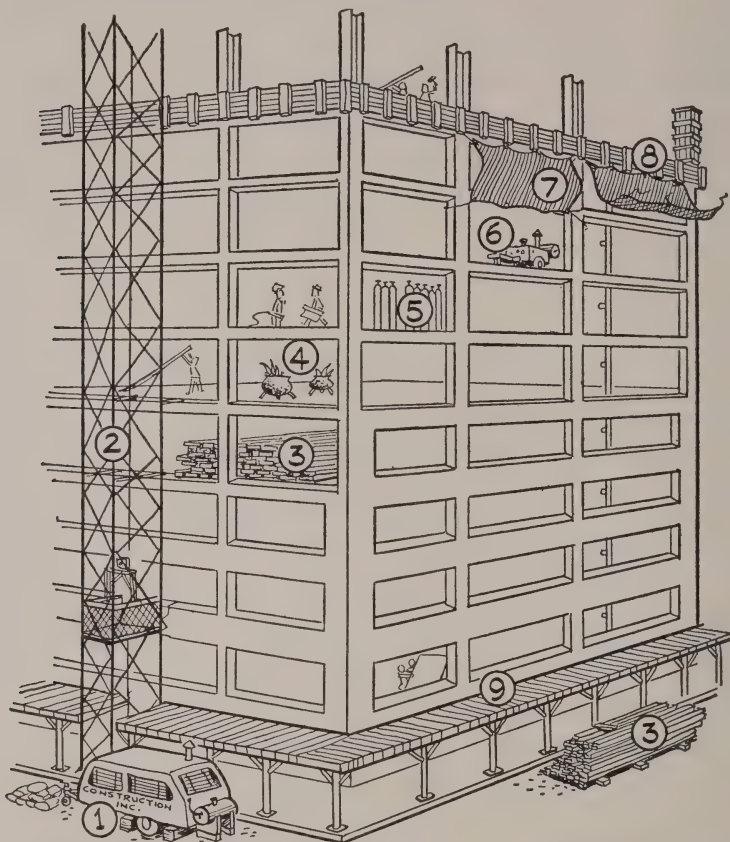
Hazards of a building under construction: (1) flammable gas for heating; (2) hoists, dangerous to use; (3) lumber; (4) salamanders; (5) tanks of flammable gas; (6) gas heaters for drying; (7) tarpaulins; (8) wooden forms; (9) wooden bridging.
